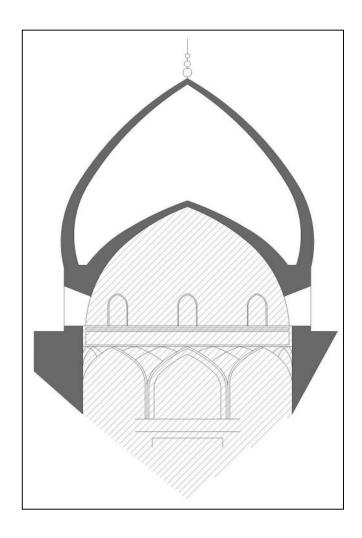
Eight openings around the dome allowing sunlight to reach inside. (Author)
